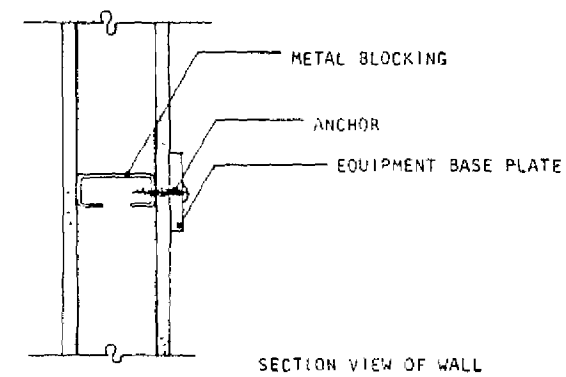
Water systems. Anchorage of upright liquid tanks to structural walls
